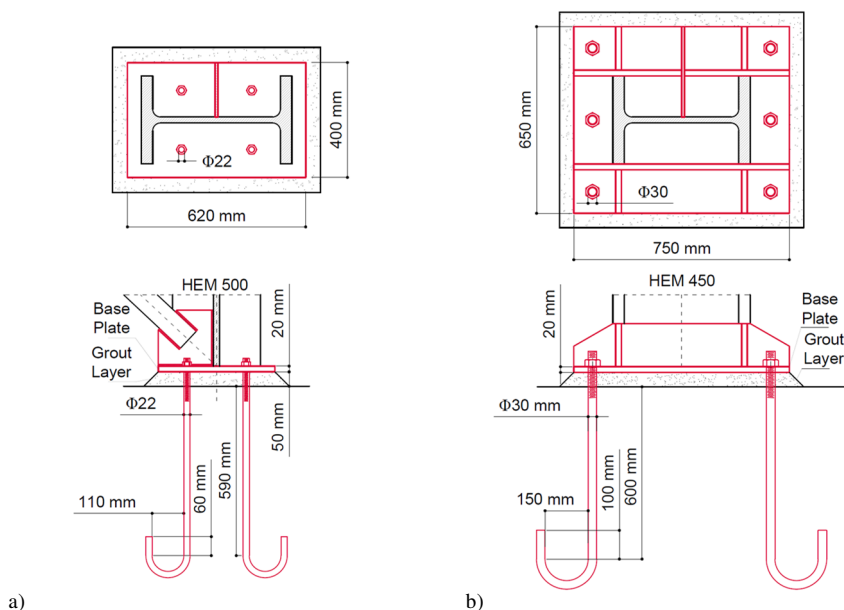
Column base connections: (a) PCB case; (b) SCB case.
